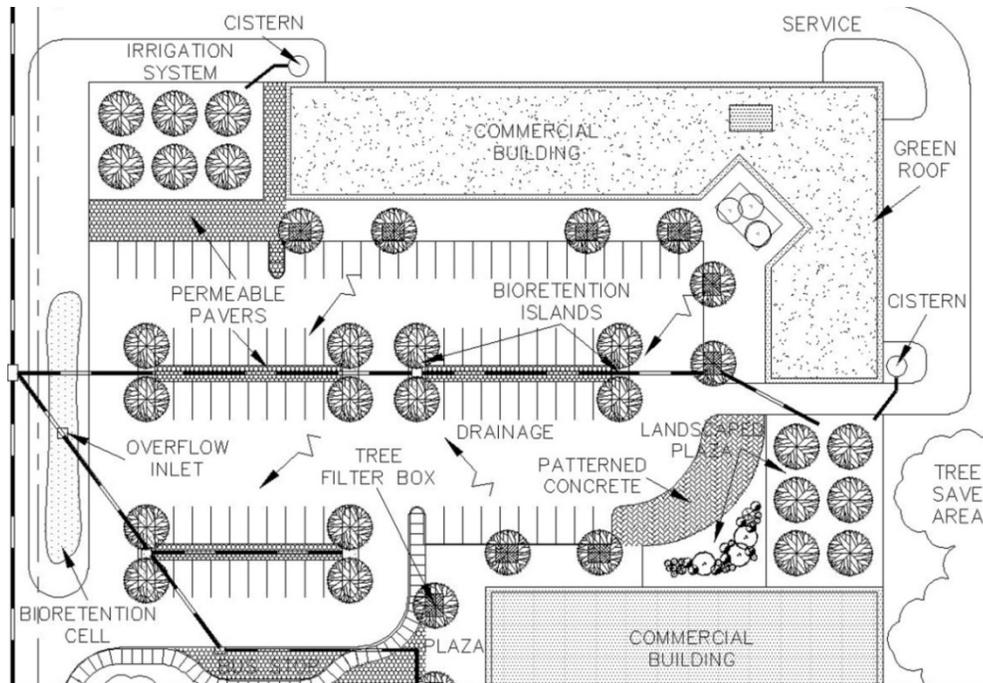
Example of layout of commercial hardscape with planters, tree containers and bioretention islands to manage stormwater runoff from impervious paving.
